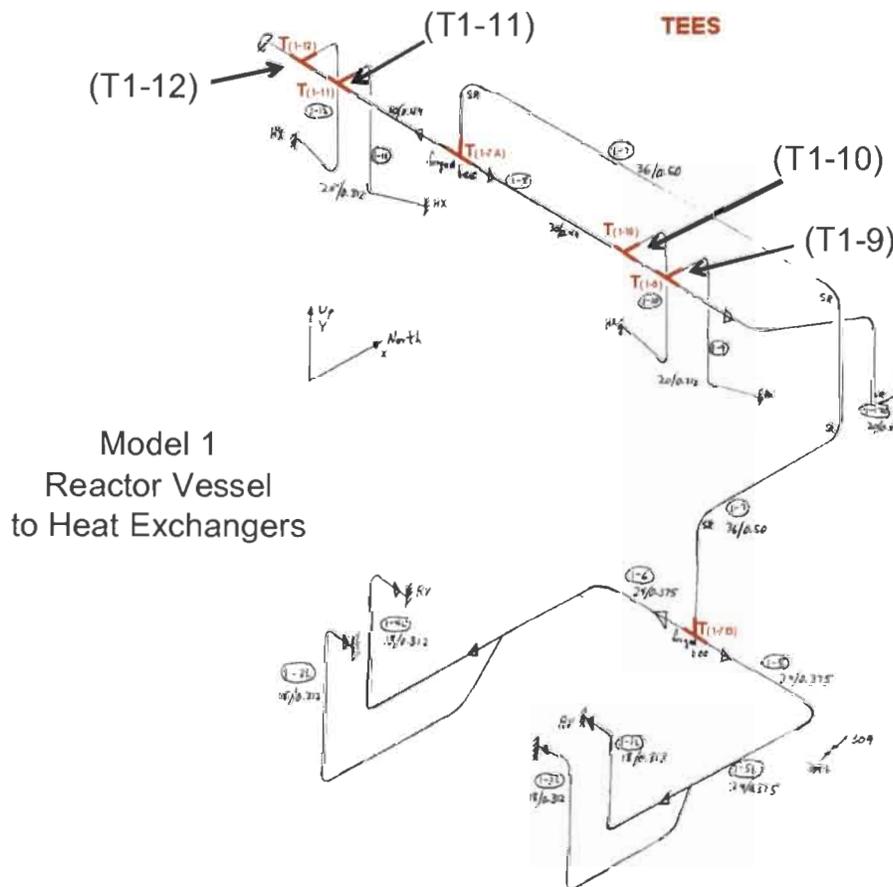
Piping Model 1, showing 30-in x 20-in reinforced tees locations.
